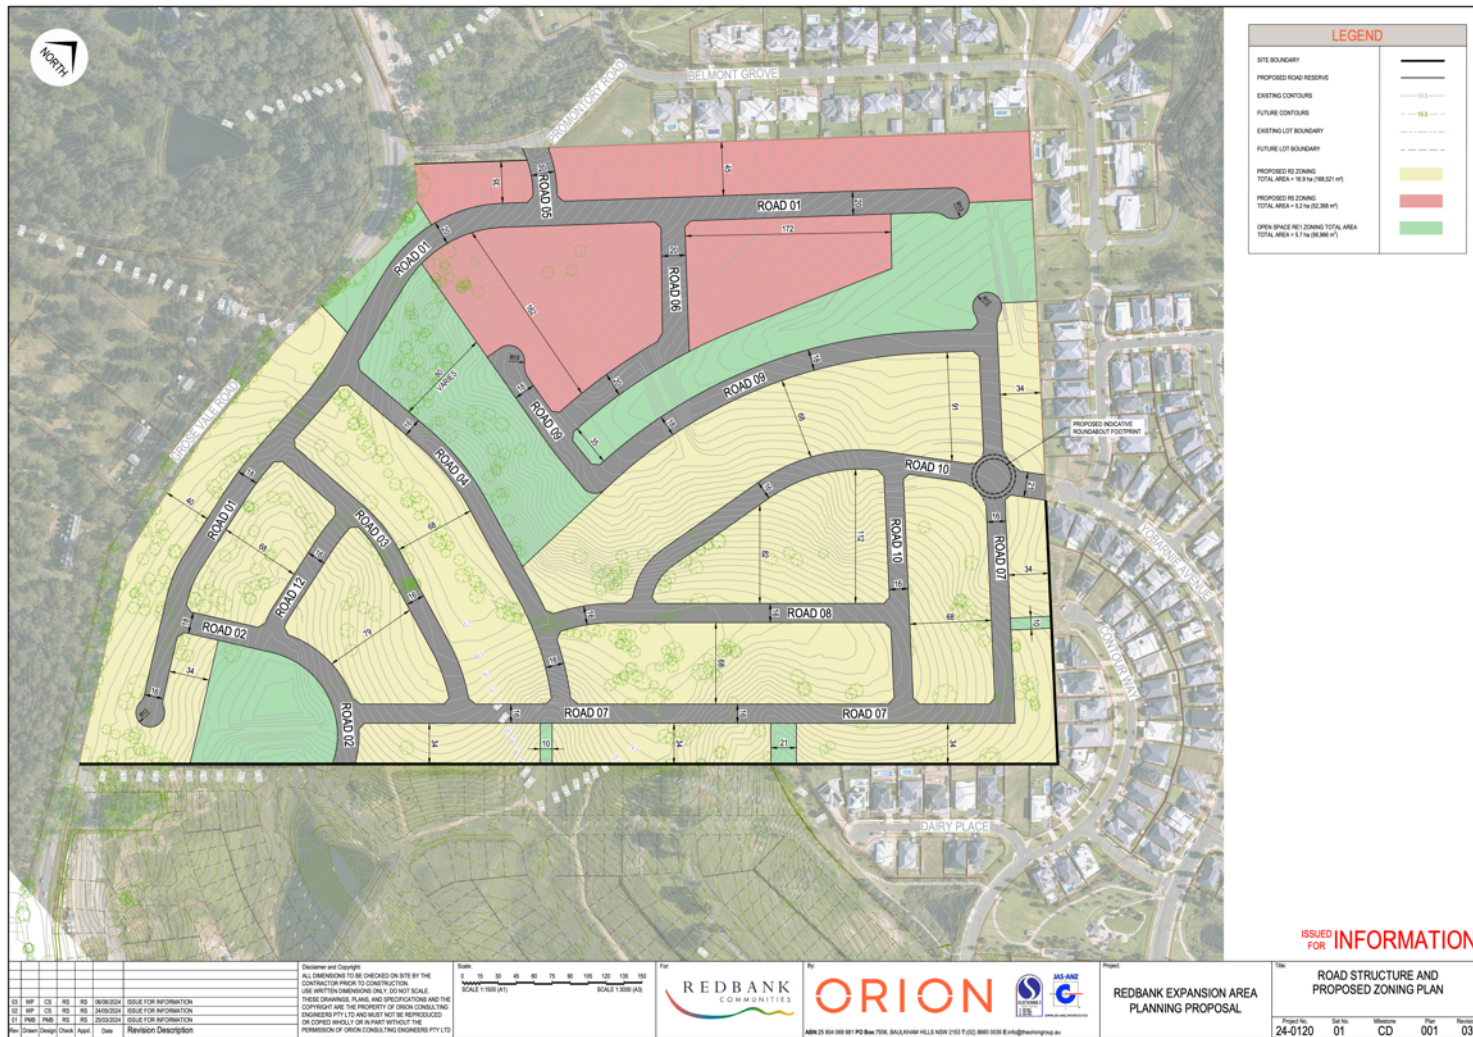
Redbank 'Kemsley Park' Structure Plan
